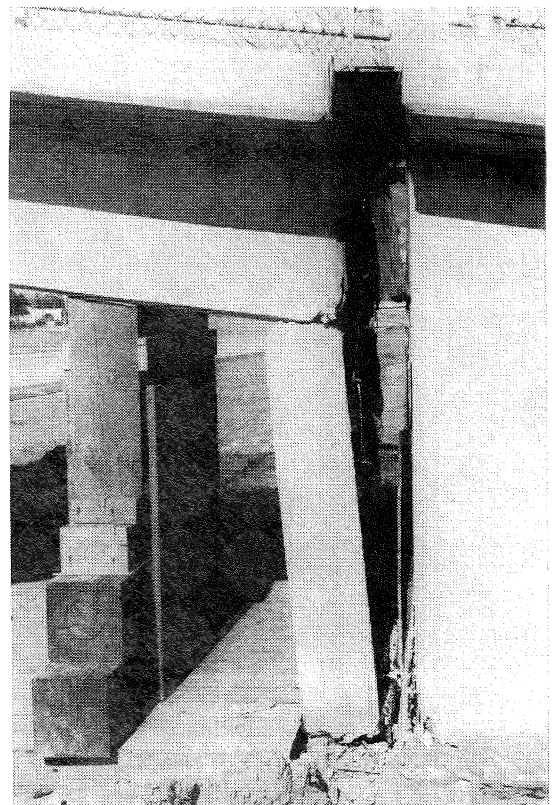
Separation of the seating from the abutment structure at the northern end of the Tyler Street Pedestrian Overcrossing.
